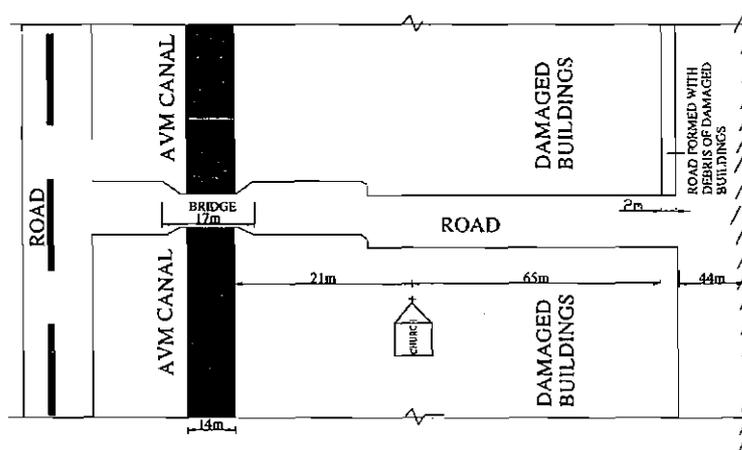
Plan Of A Damaged Area Kottilpadu Colachel
